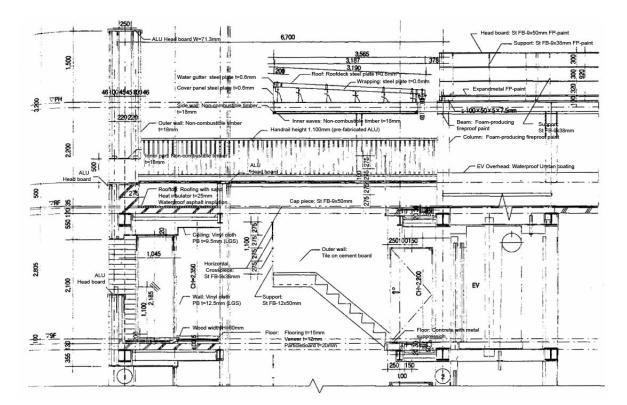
h – Detailed section: 9th floor – roof; Dimensions in [mm]
